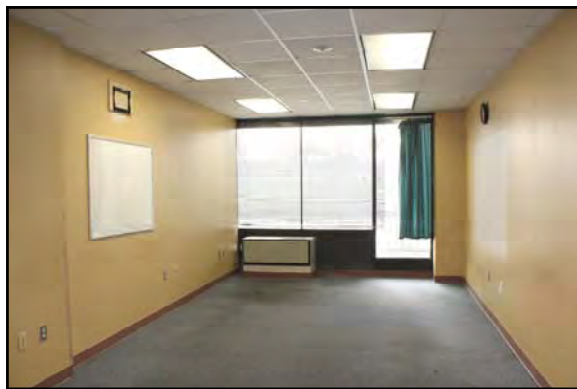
## PHOTOS - MAIN BUILDING "1ST FLOOR"
